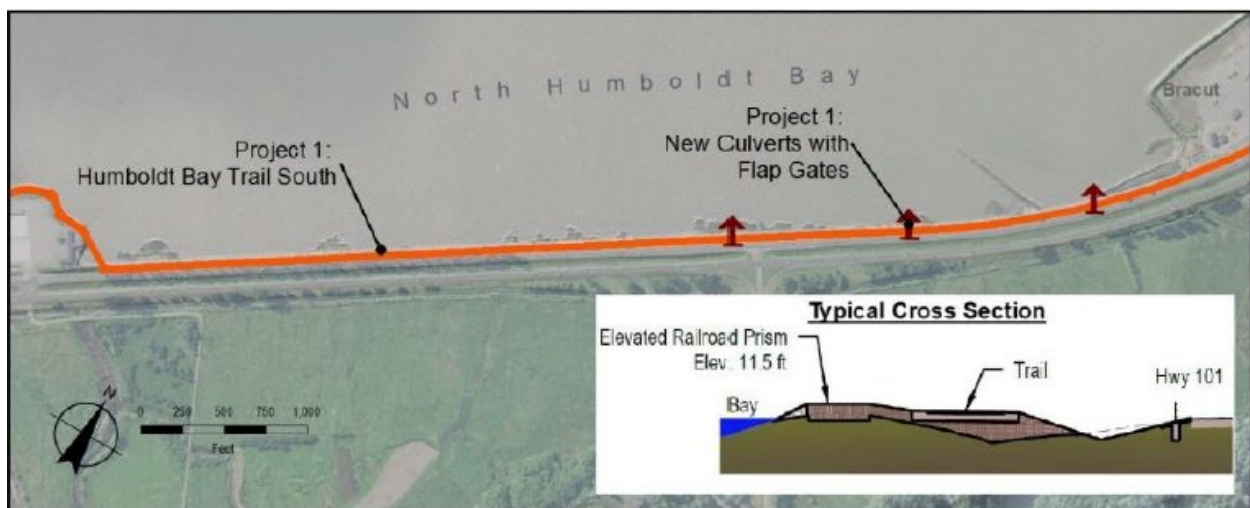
Design of the Humboldt Bay Trail South. Three new culverts were installed between the Indianola Cutoff and Bracut that did not have flap gates installed yet during the 2024/2025 winter-time king tide monitoring, increasing water in the ditch between the trail and roadway.
